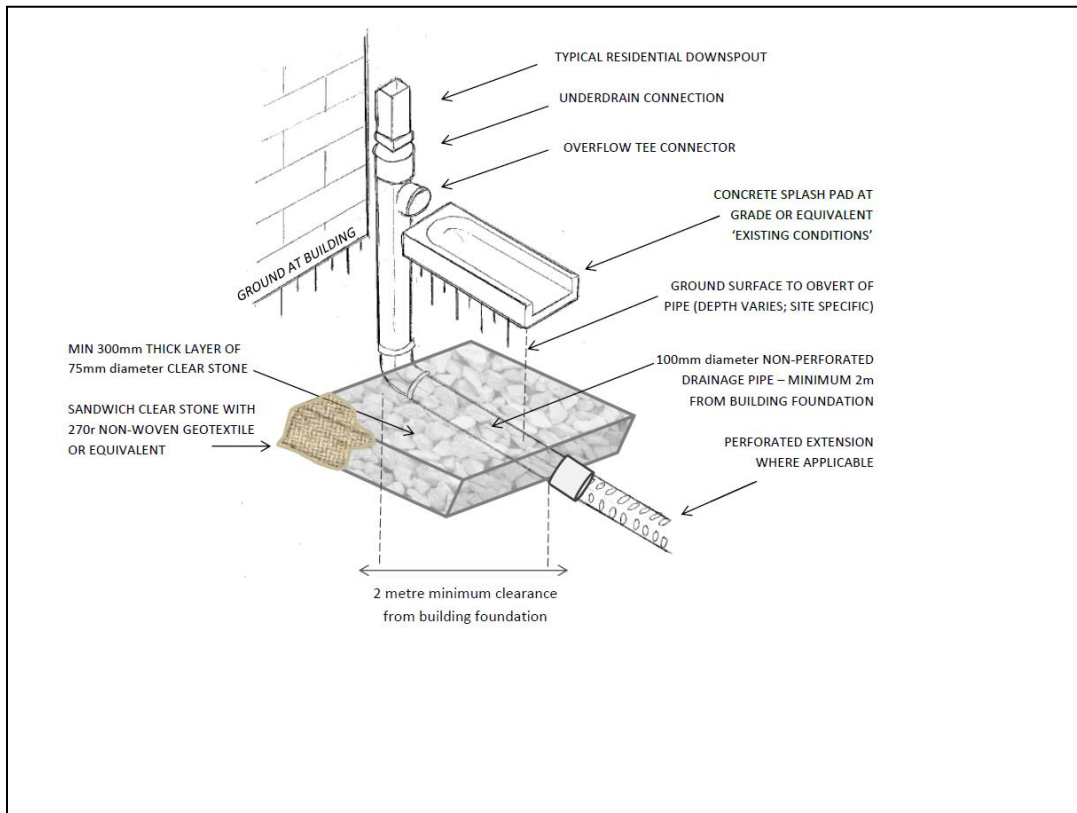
Typical Downspout Detail (as provided in the RFQ document).
